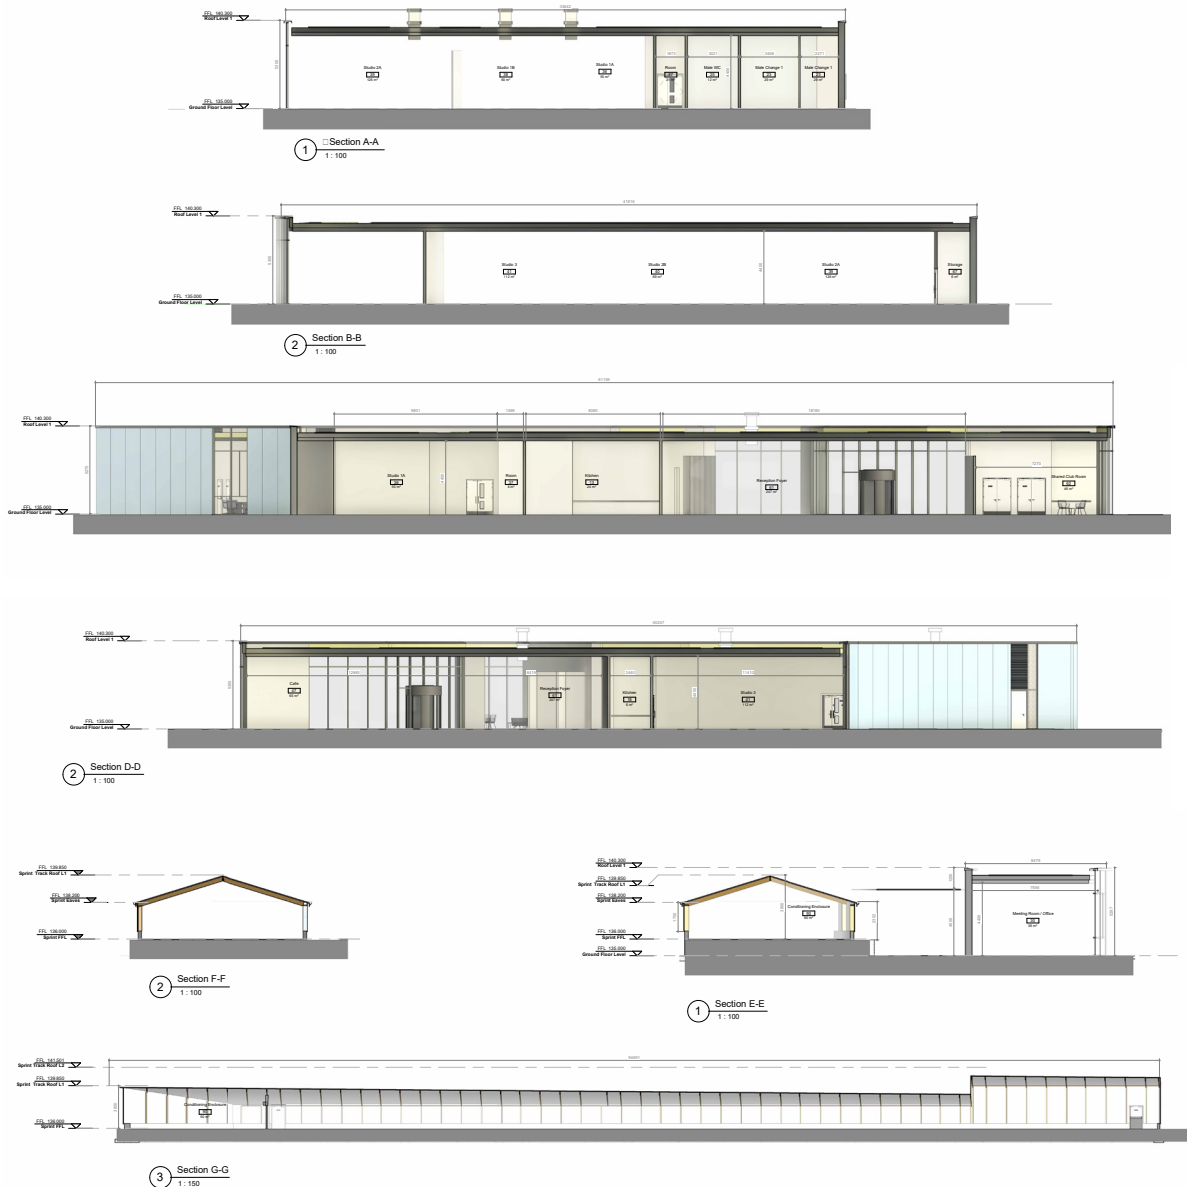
PROPOSED SECTIONS AND ELEVATIONS
